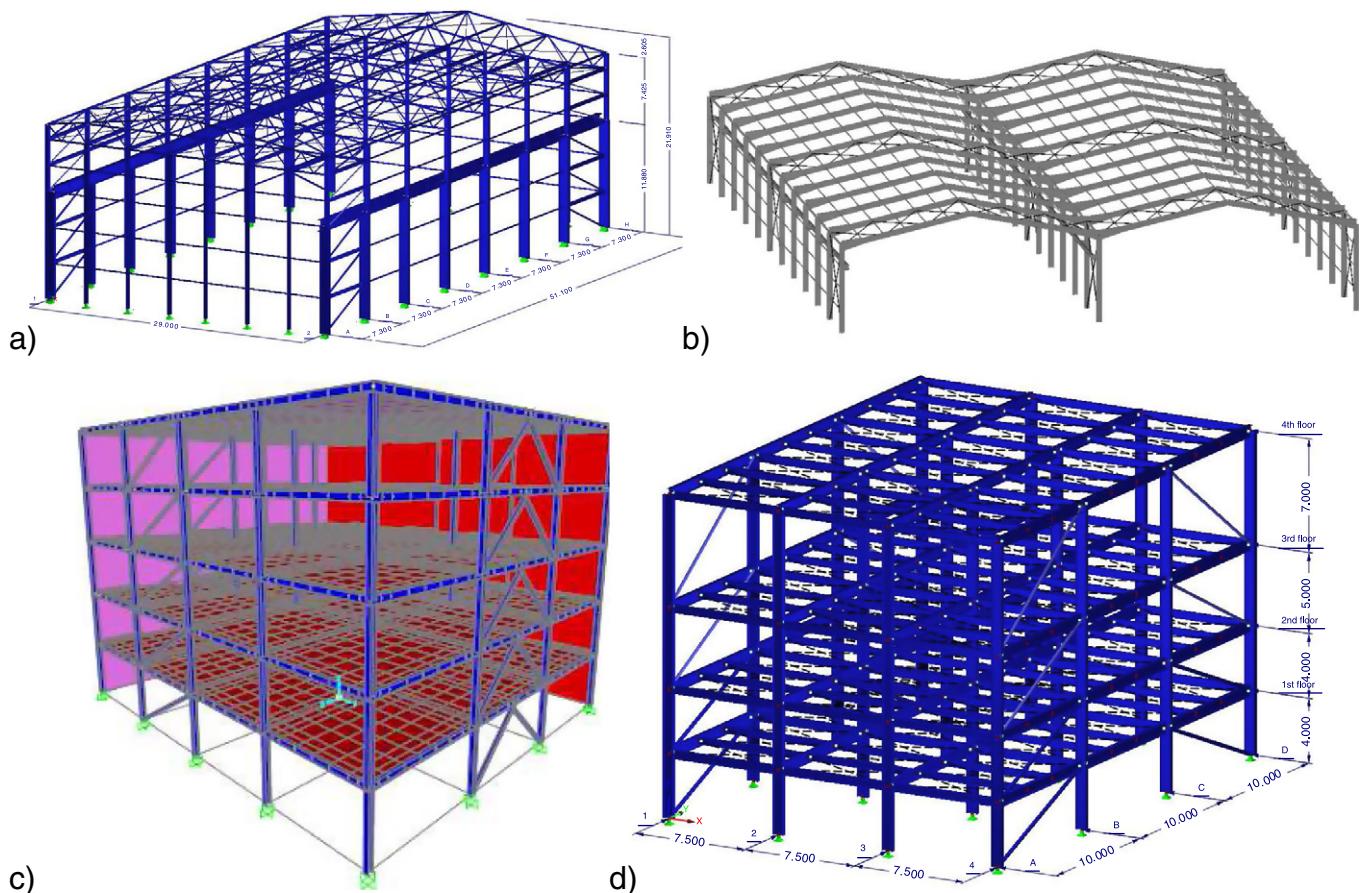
a) Industrial building for electrical power plant activities; b) industrial building for warehouse/light activities; c) EBF and CBF configurations for offices; d) MRF and CBF configurations for industrial storage.
